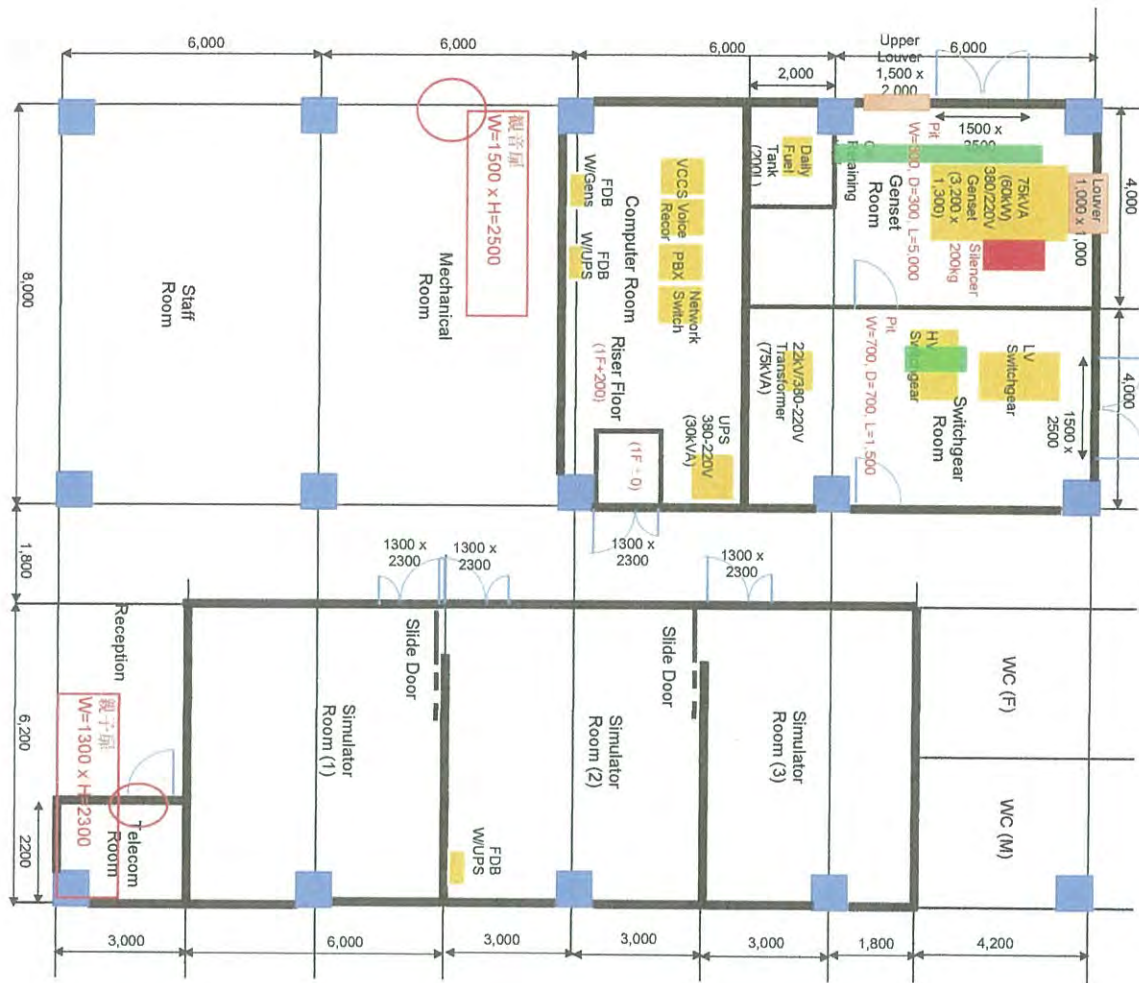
Draft layout plan of the ATC tower office building
